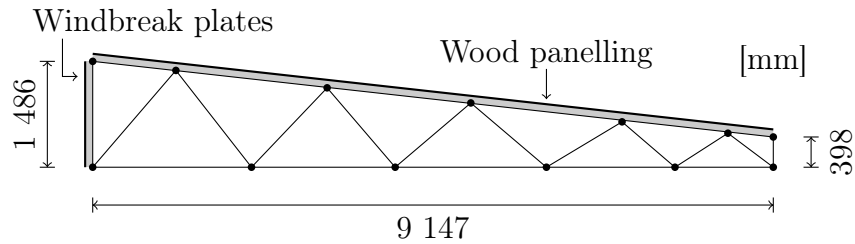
Illustration of roof models with windbreak plates and wood panelling.
